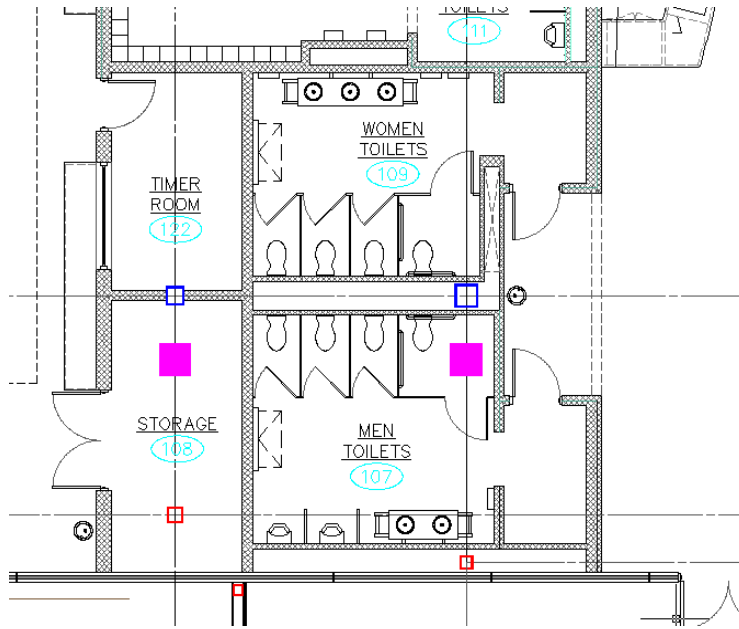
Men's Restroom, Women's Restroom, Timer Room and Storage Room (Ground Level)
